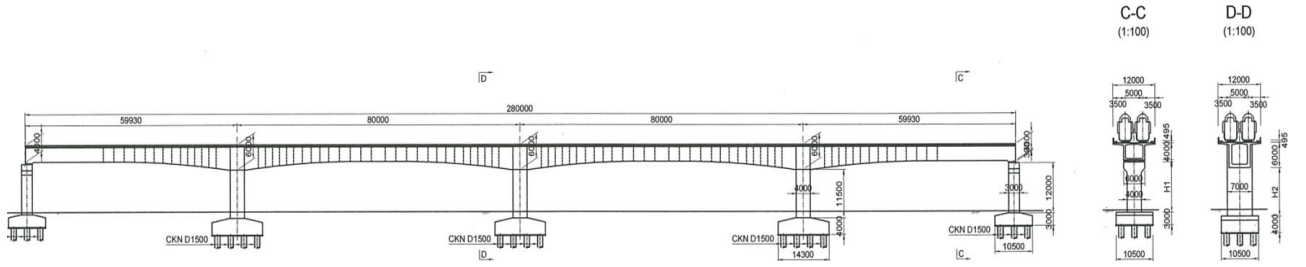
Typical structure of box girder bridge with spans of 60–80–80–60 meters of the North–South high-speed railway project (Pre-feasibility study stage)
